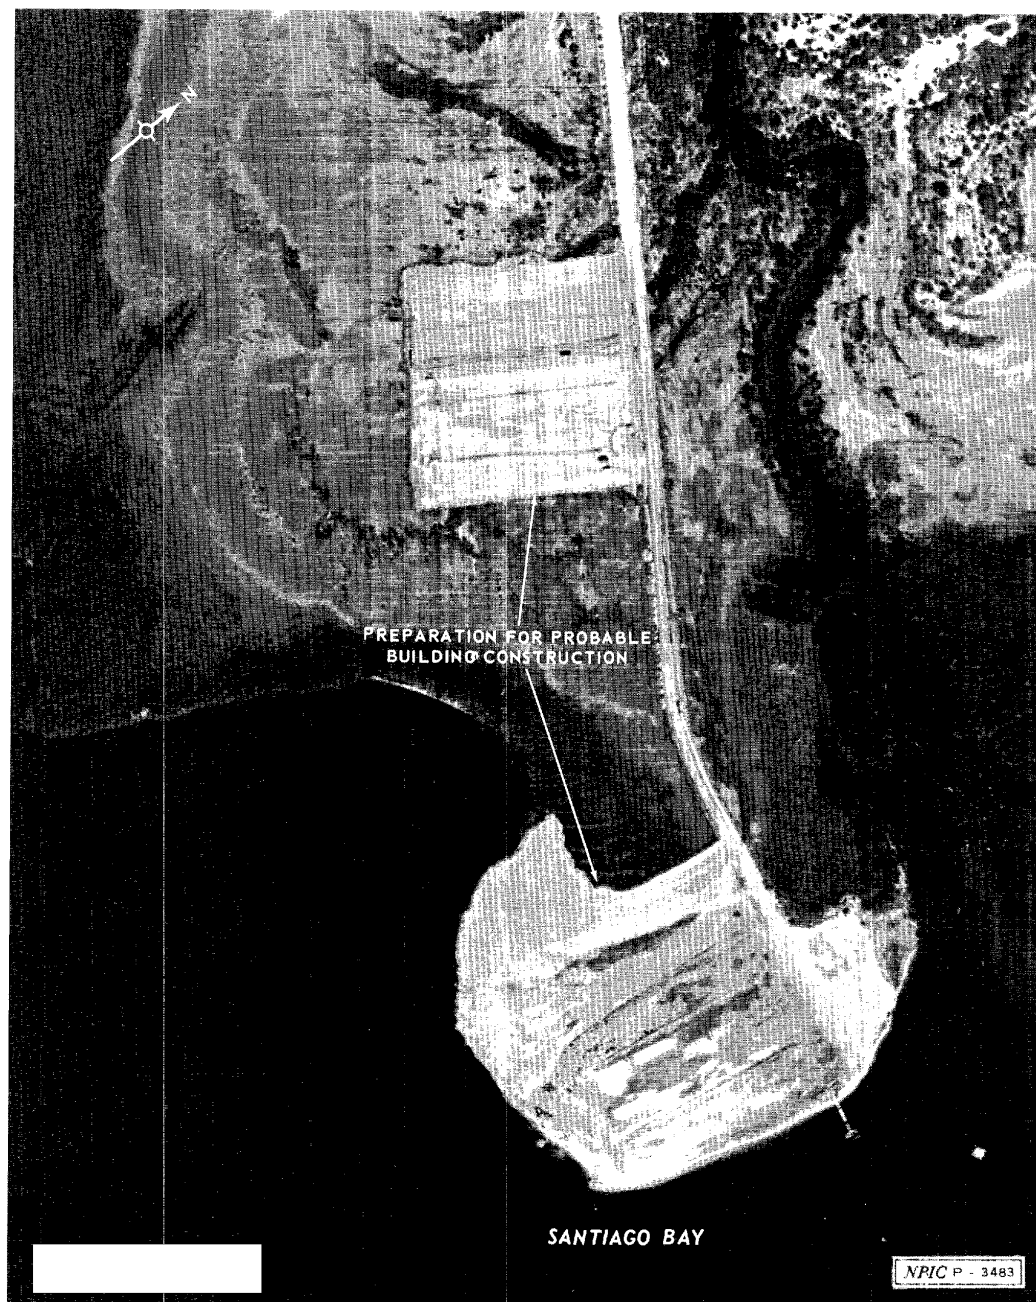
BUILDING CONSTRUCTION, PLAYA RANCHO LUNA, CIENFUEGOS AREA
